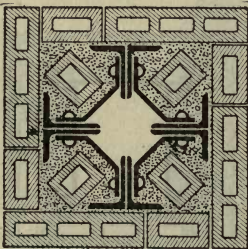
Rectangular Terra-Cotta Column Protection.
